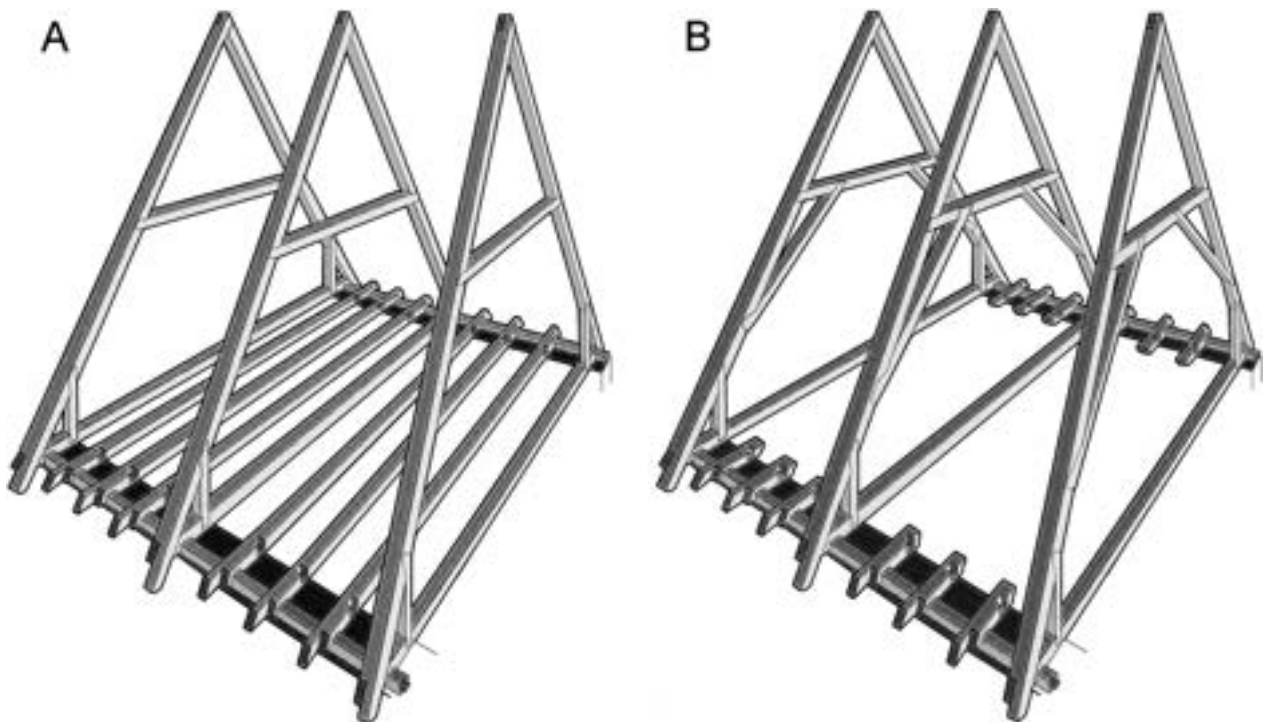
A – a common tiebeam roof: B – an intermittent tiebeam roof.
